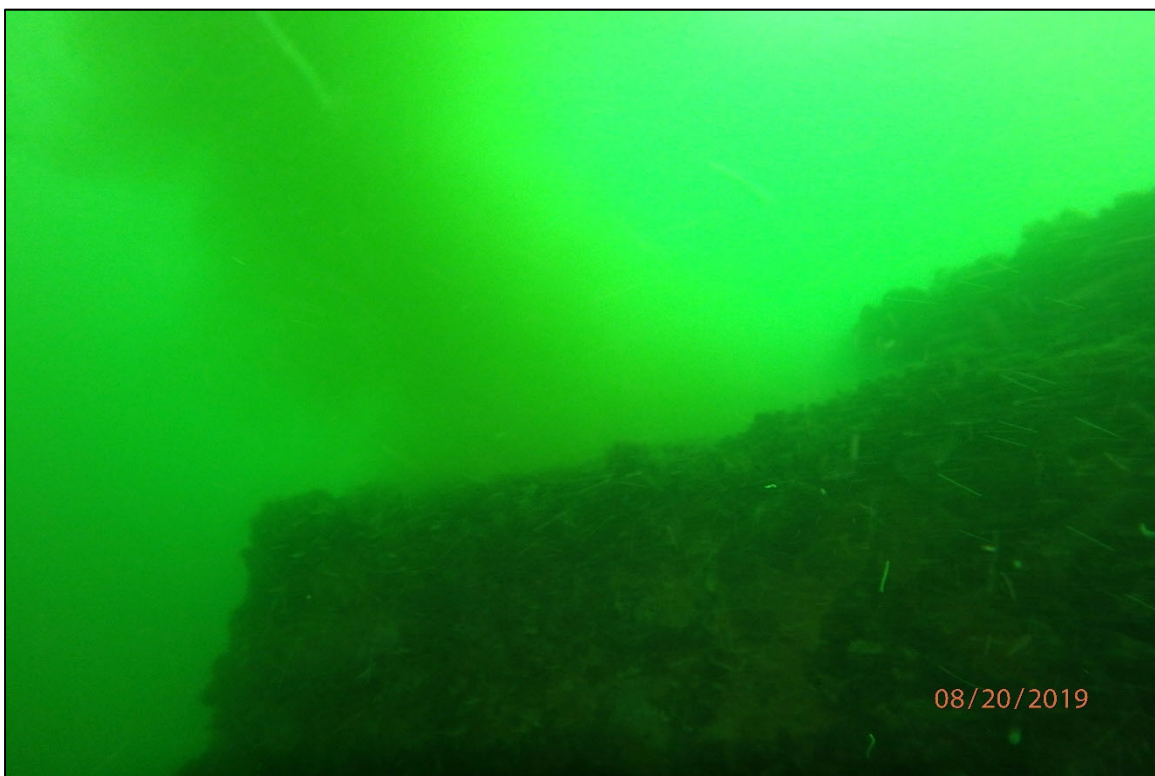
Effluent Escaping Northwest Corner of Cleanout Chamber Cap (Looking Northeast).
